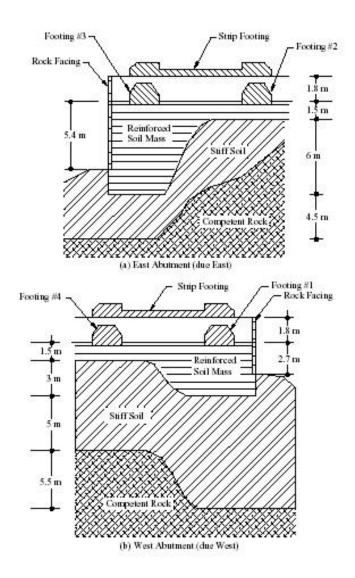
Footings and Foundations of Black Hawk Abutment, Wu, et al., (2003).
